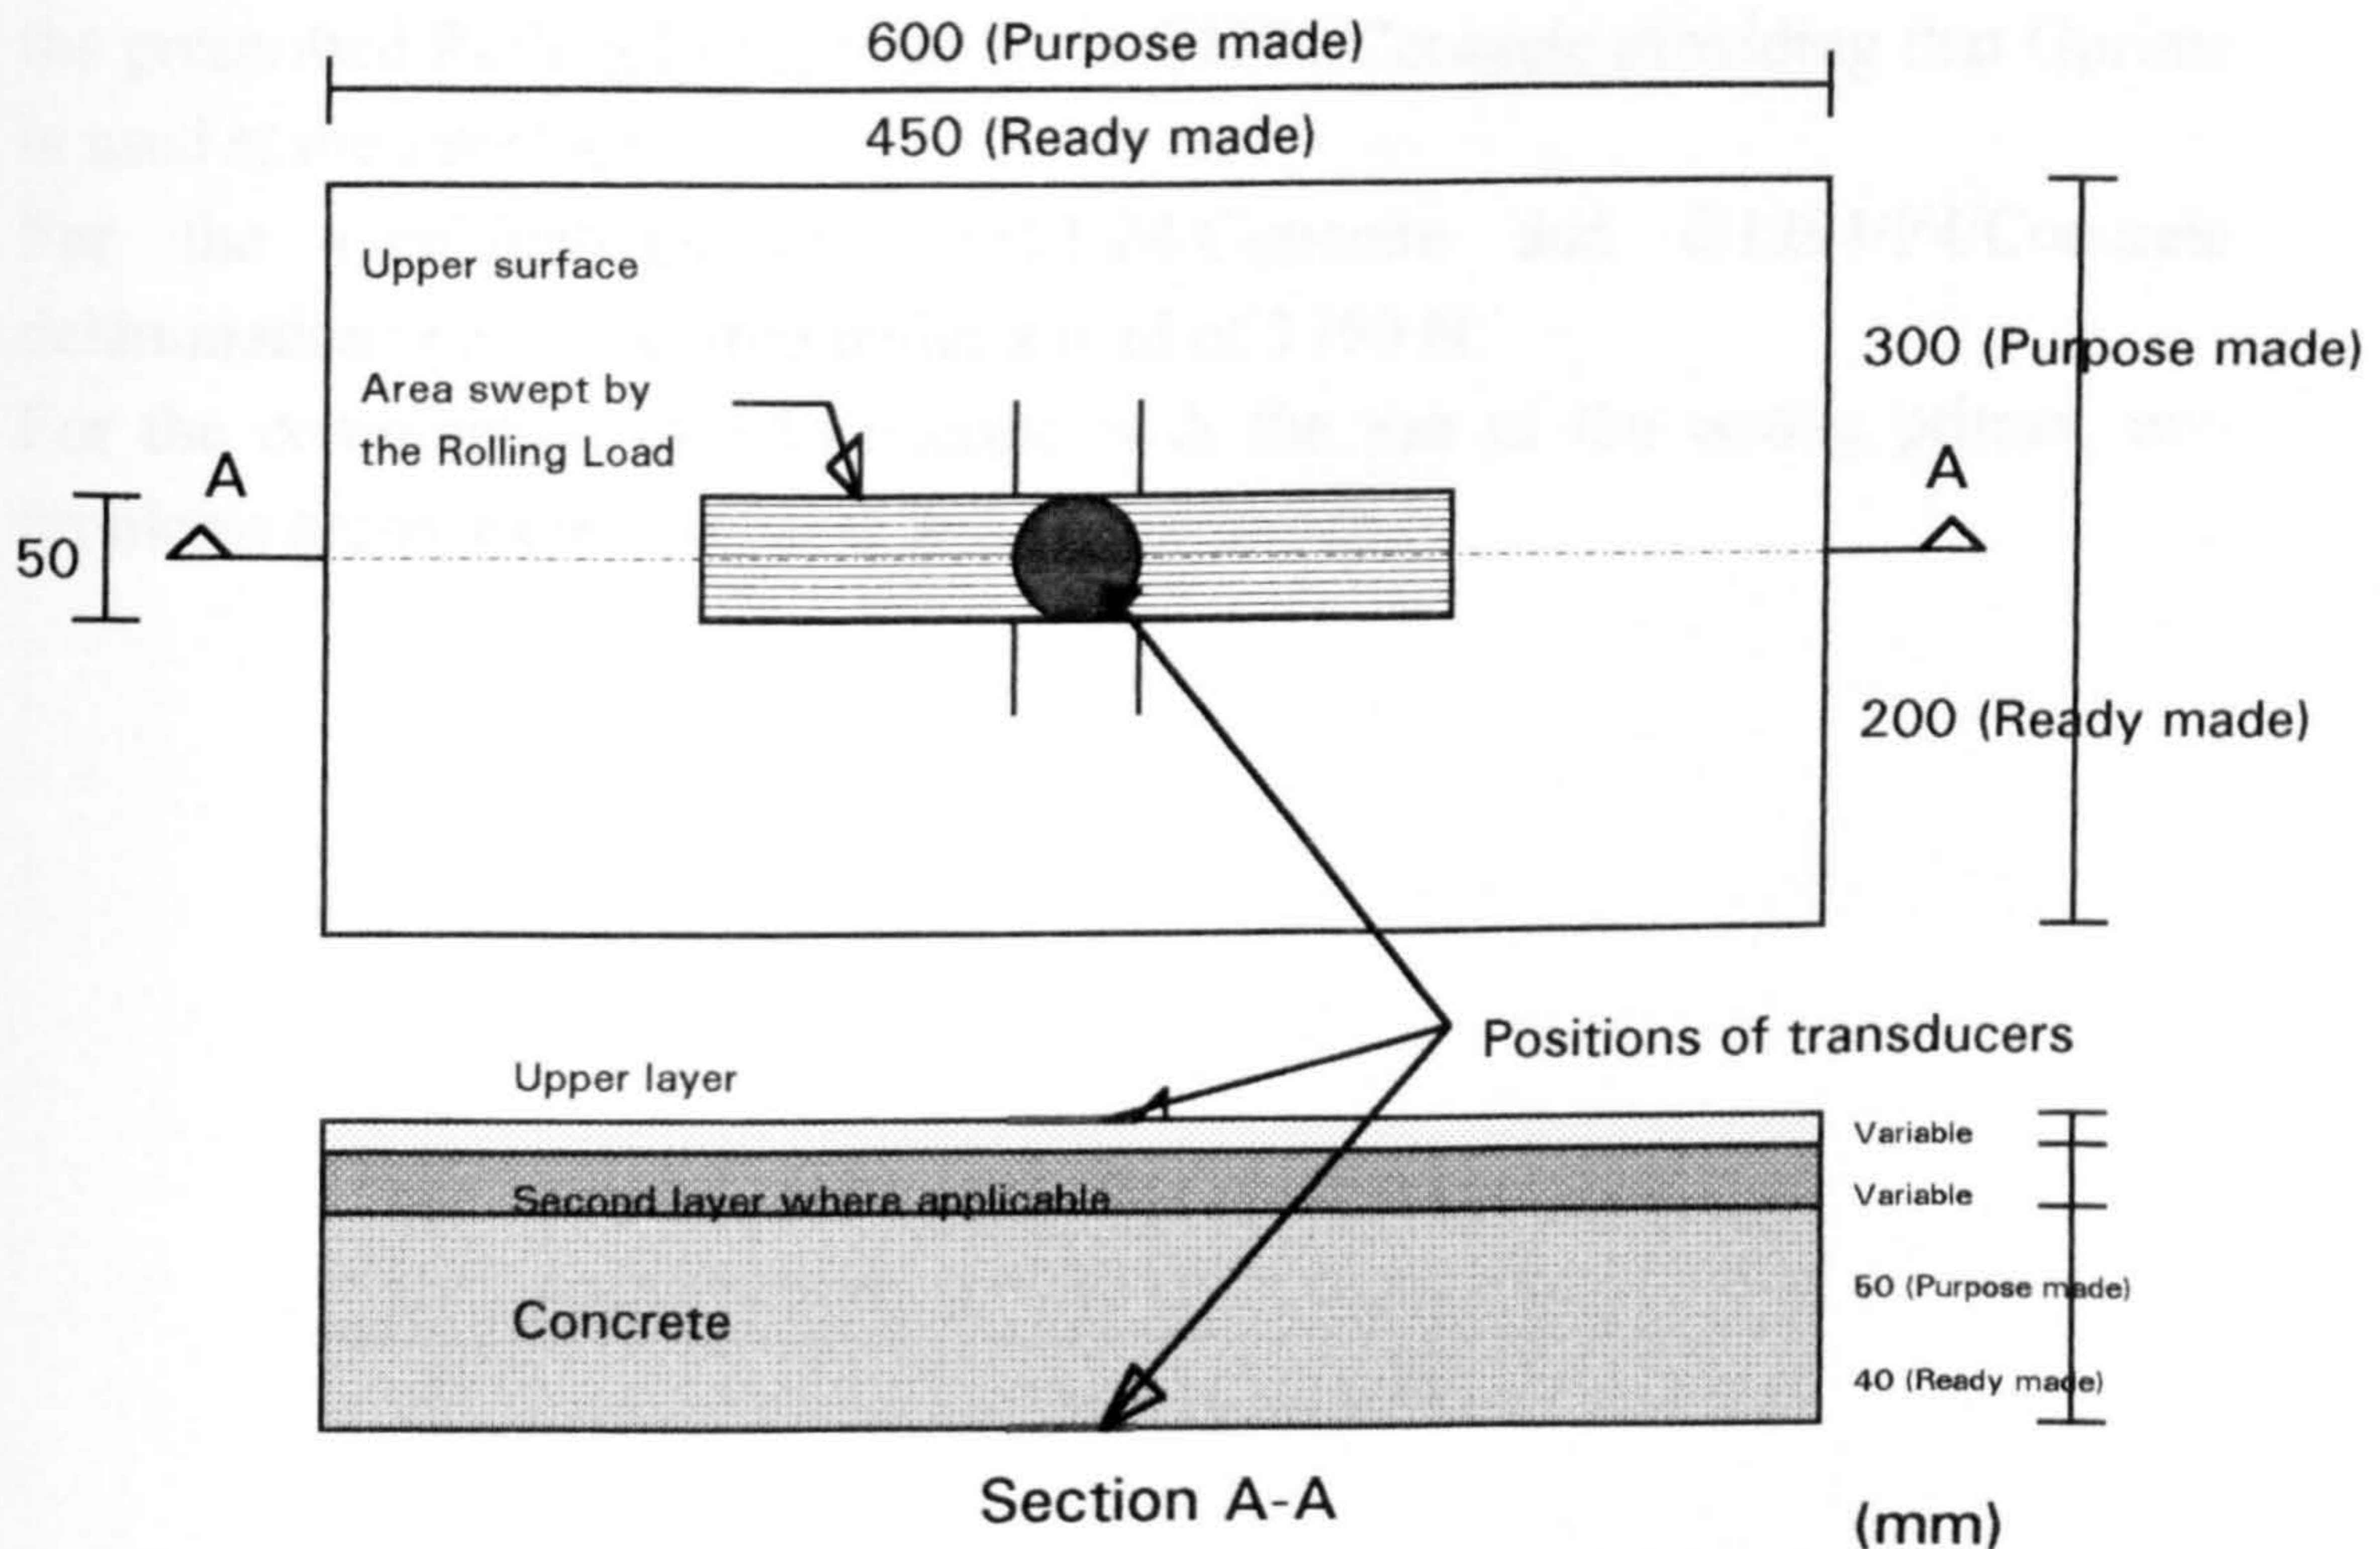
Schematic of the specimens in the Steel Wheel Rolling Load experiment
